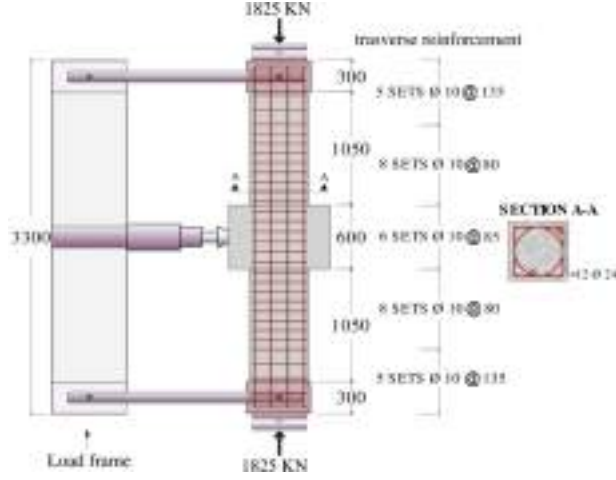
General geometry, reinforcement details, and test setup, adapted from Gill (1979). Length units are expressed in millimetres.
